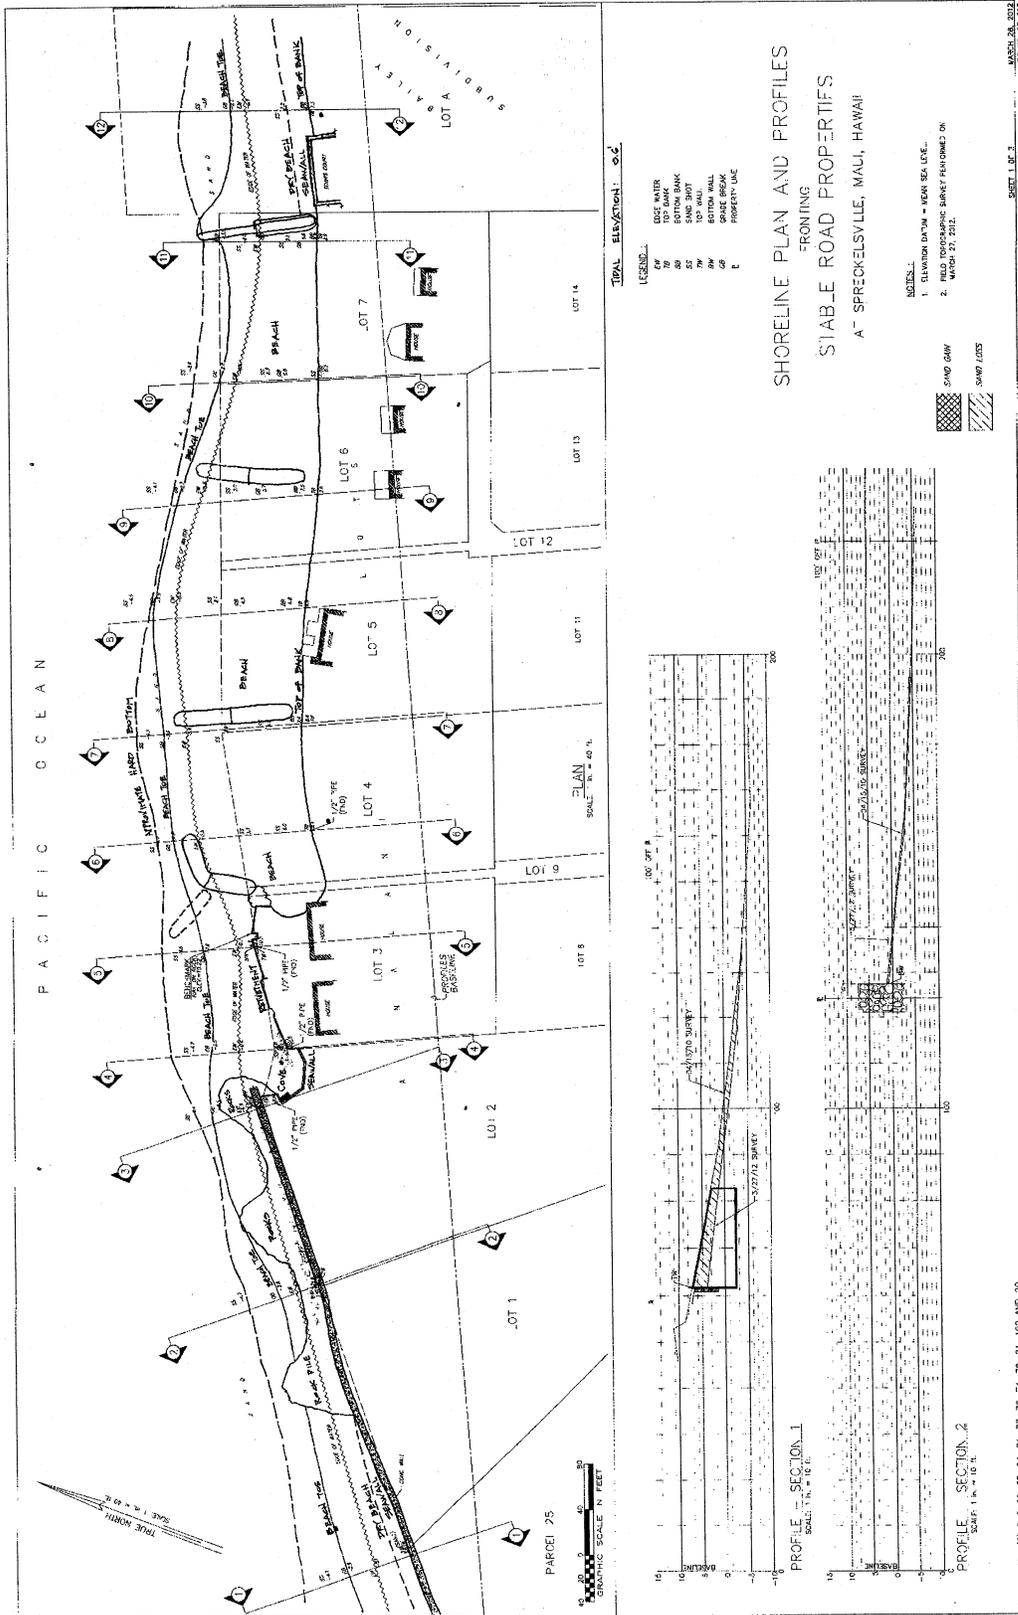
Post-Construction Site Plan and Beach Survey Profiles, 27 March 2012
